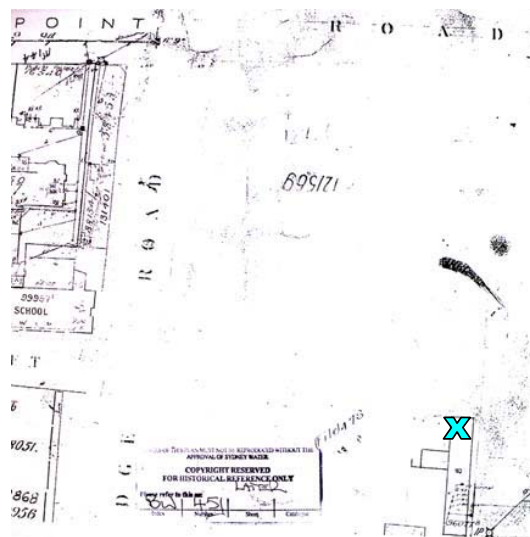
Reissued Sydney Water plan BW451 dated 2nd June 1938, showing the site bare following the demolition of *Hereford House*. The blue cross shows the women's toilets for the villa, seemingly not knocked down when the mansion was demolished. Source: Sydney Water plan room.
